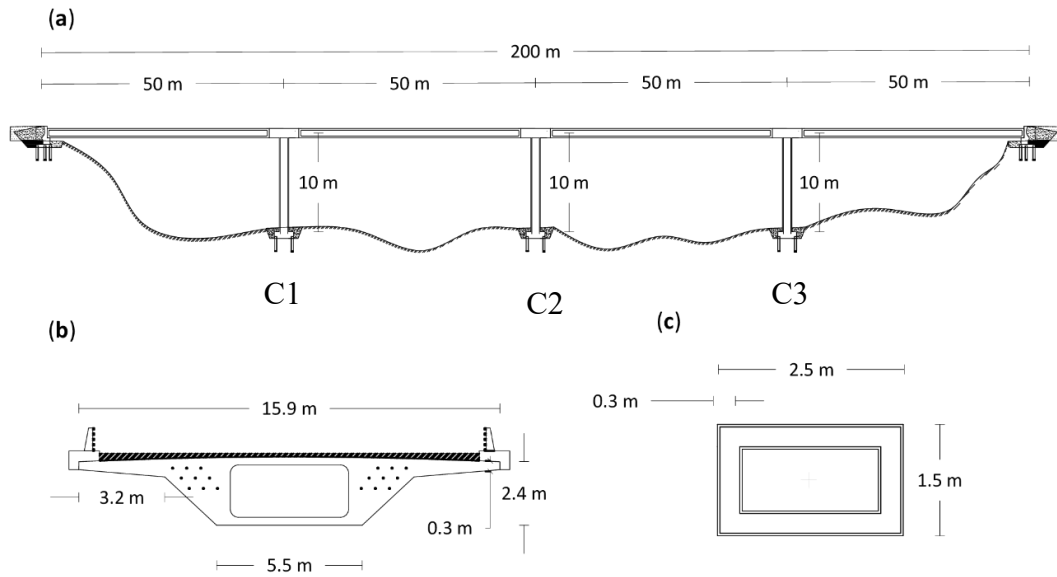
; configuration of studied real bridge; (a) bridge arrangement; (b) deck section; (c) pier section.
